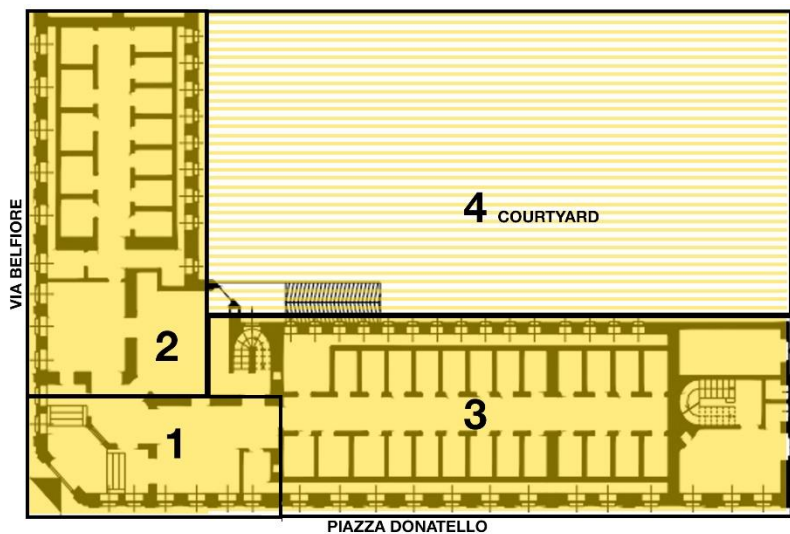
Entrance(1), Restaurant and Classrooms(2), Classrooms(3), Courtyard(4), Ground Floor Plan of Casa del Quartiere (Source: Developed by the author)
